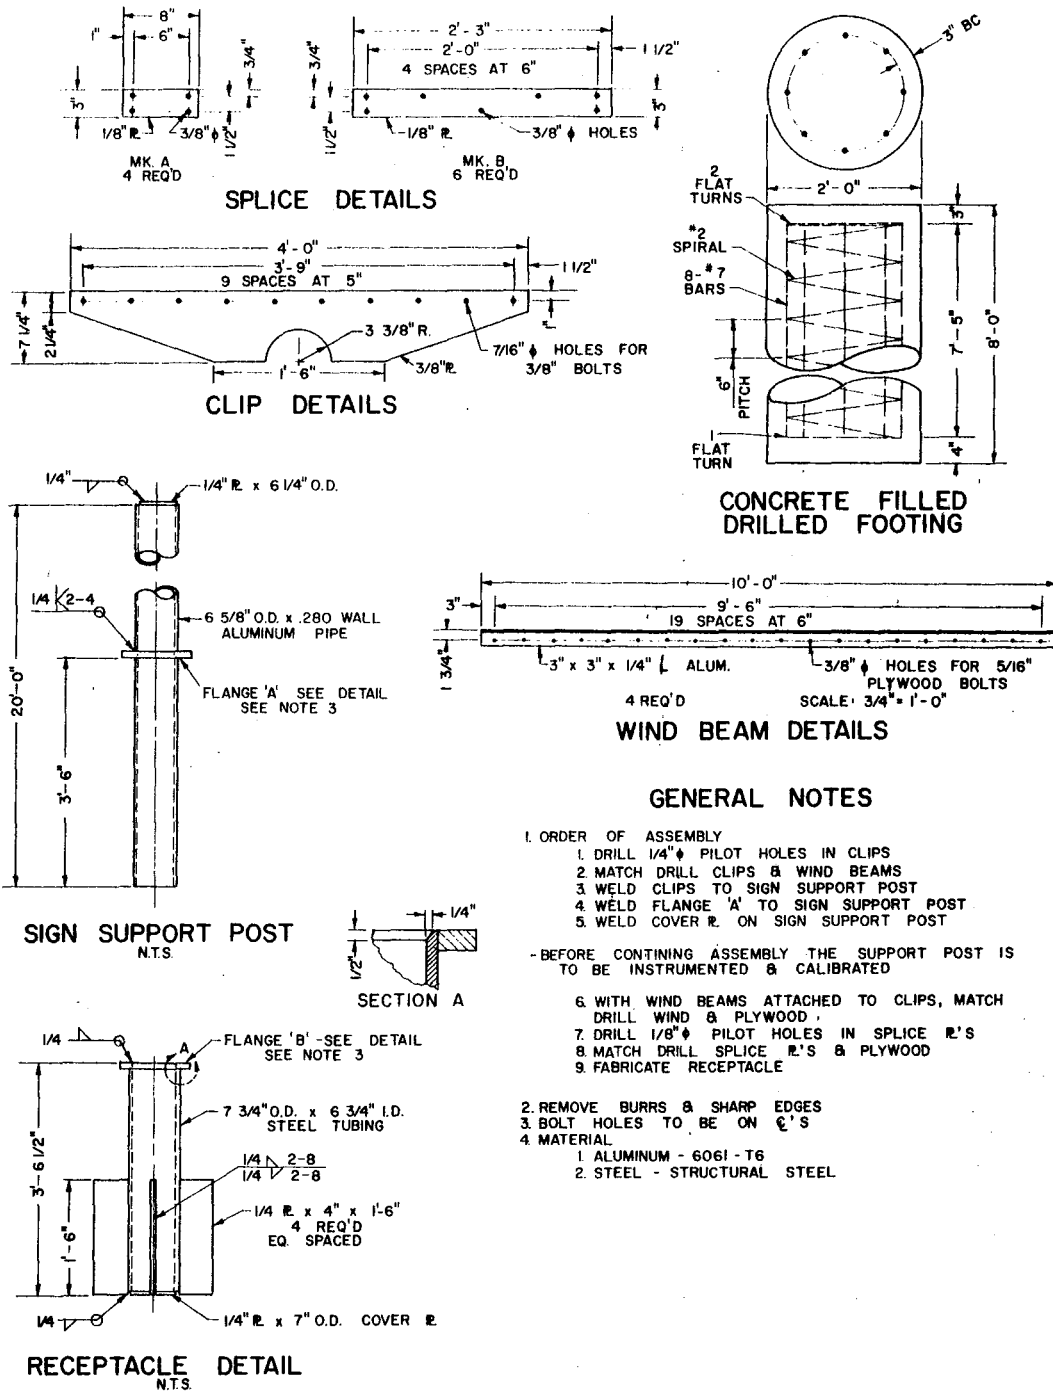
FULL-SCALE SIGN DETAILS, PART I
